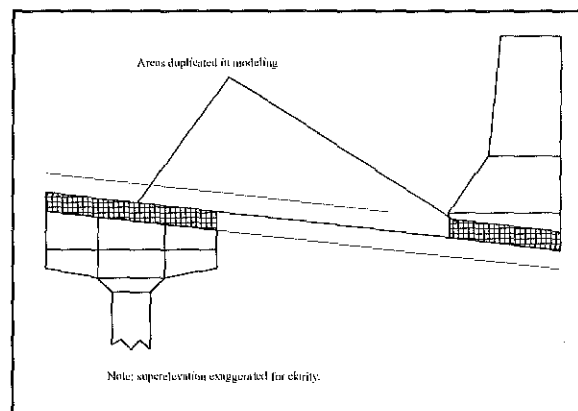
Overlapping Regions Due to Solid Element Modeling of the Girder Haunches and Barrier Walls.
